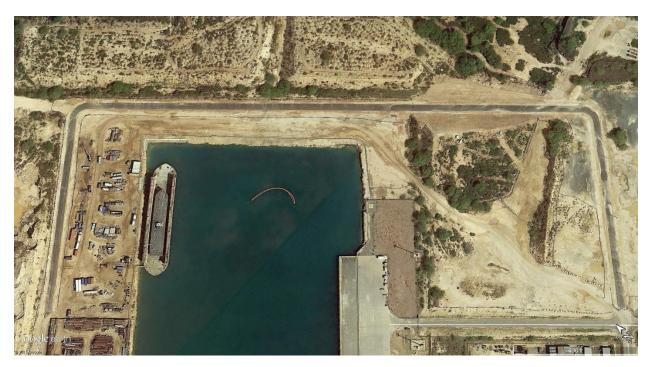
Kalaeloa Barbers Point Harbor Access Road
